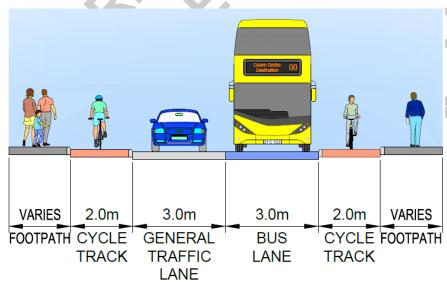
Section 2, Proposed Option 5 - Cross Section B-B
